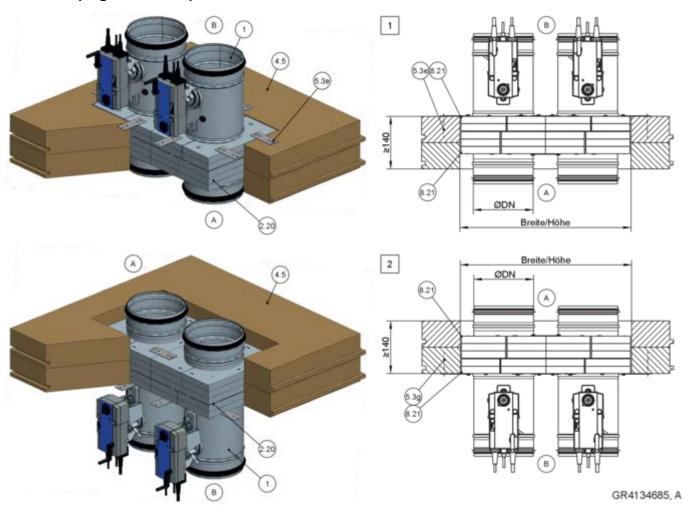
Dry mortarless installation with installation kit TS2 into solid wood ceiling, upright and suspended
